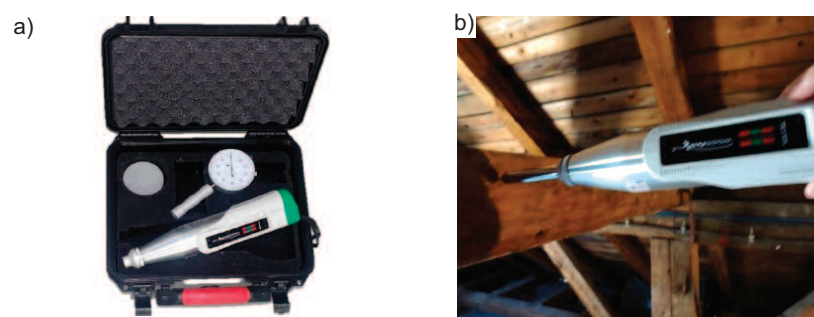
Wood testing: a) used Schmidt wood hammer; b) in-situ testing
